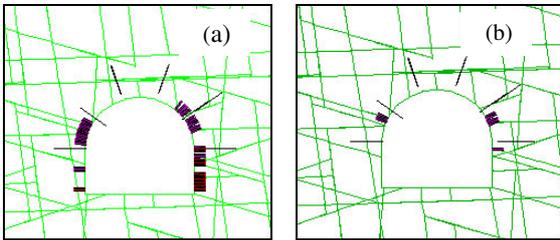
(a) Damage in URF shotcrete (b) Damage reduced in MRF shotcrete
